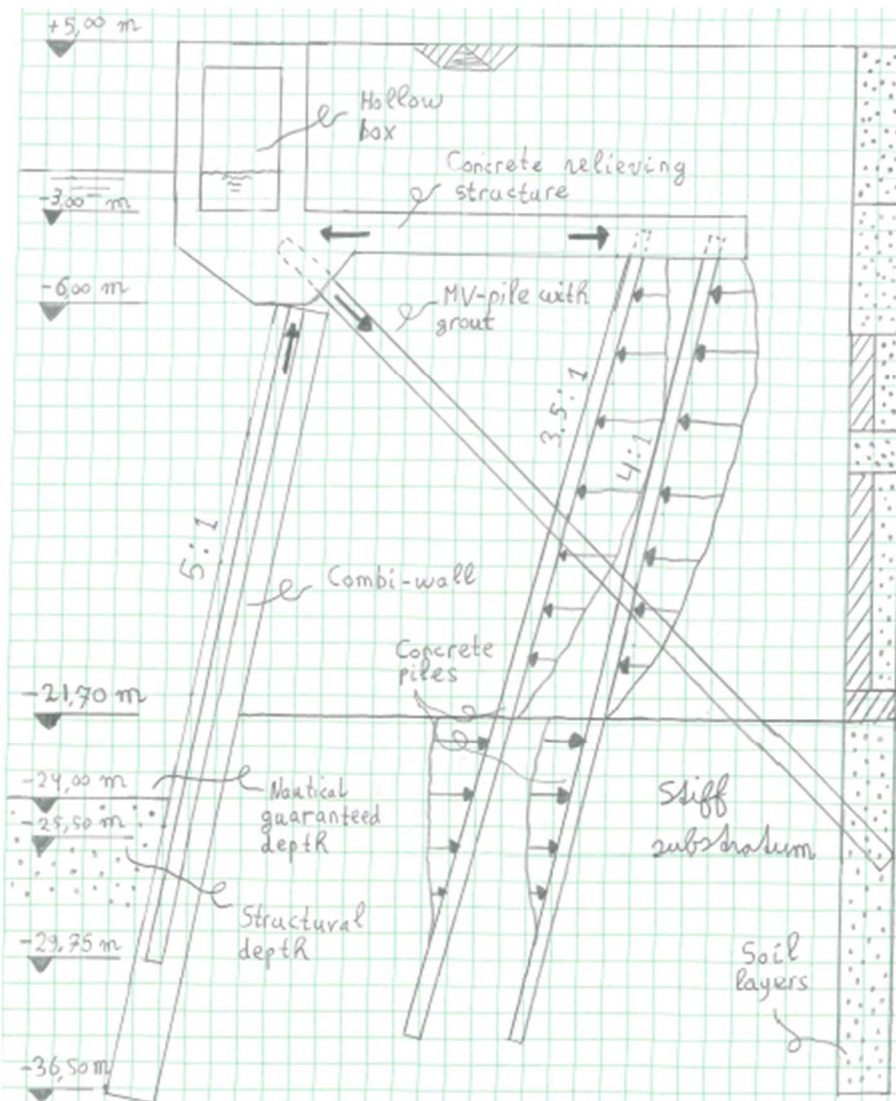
Cross-section of deep water quay wall in the Amazonehaven with passively loaded piles partially shielding the front retaining wall (Port of Rotterdam, heights in meter N.A.P.)
